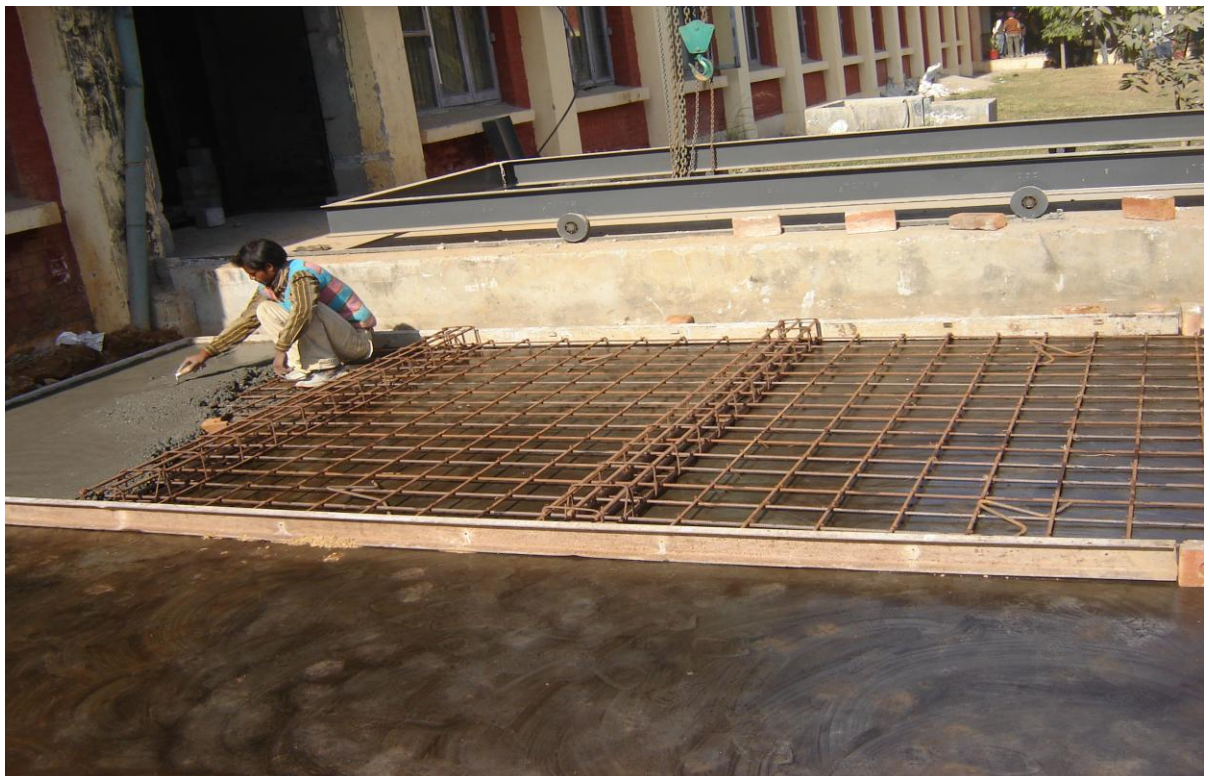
C: Typical Schematic Diagram showing Casting of 3-panel Slab
